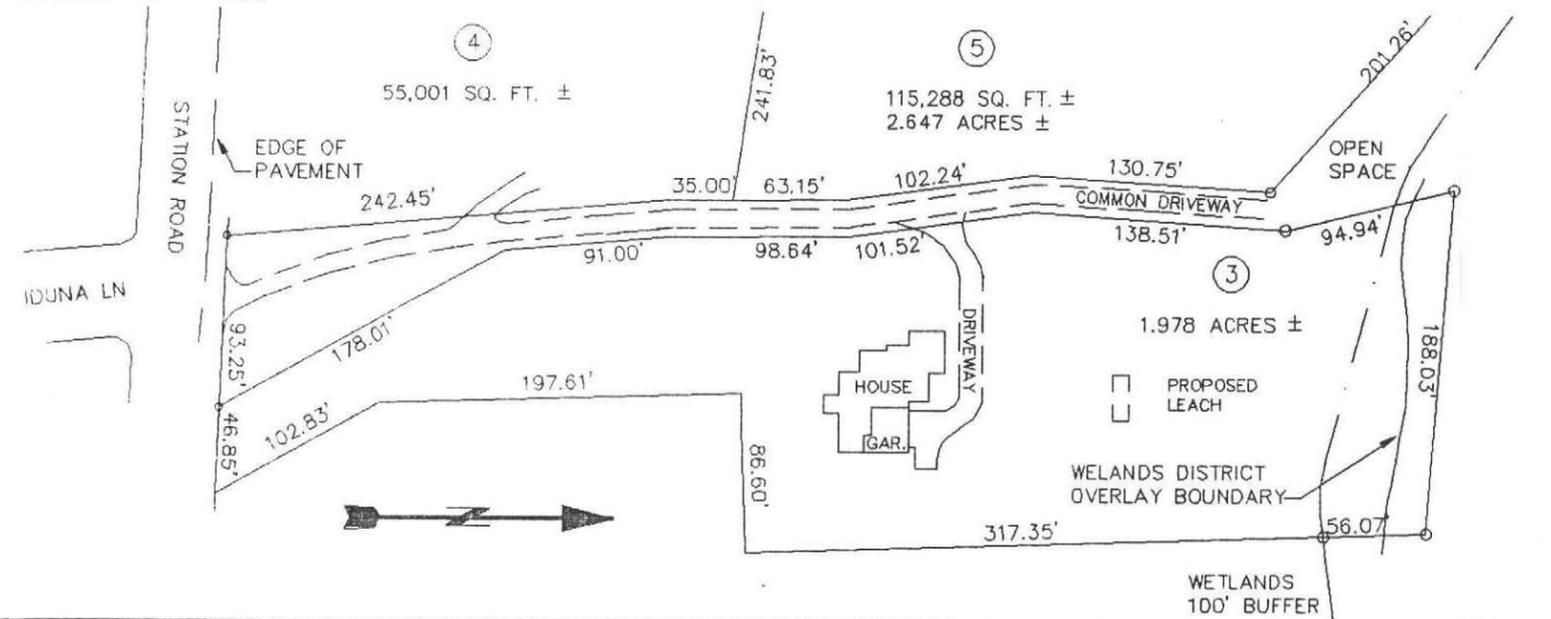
DETAIL SHOWING SEWAGE DISPOSAL SYSTEM
